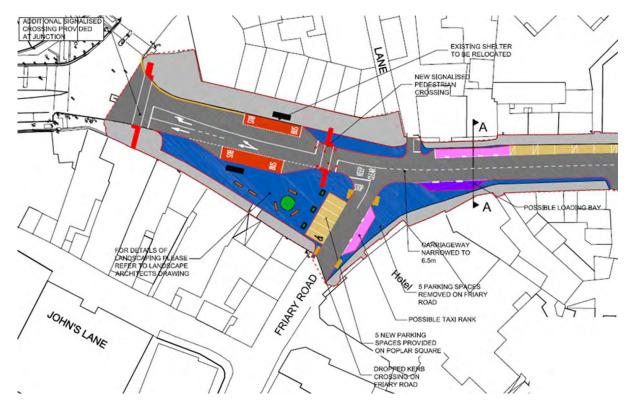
Parking Option 4: Replace Parking with Pedestrian Plaza
